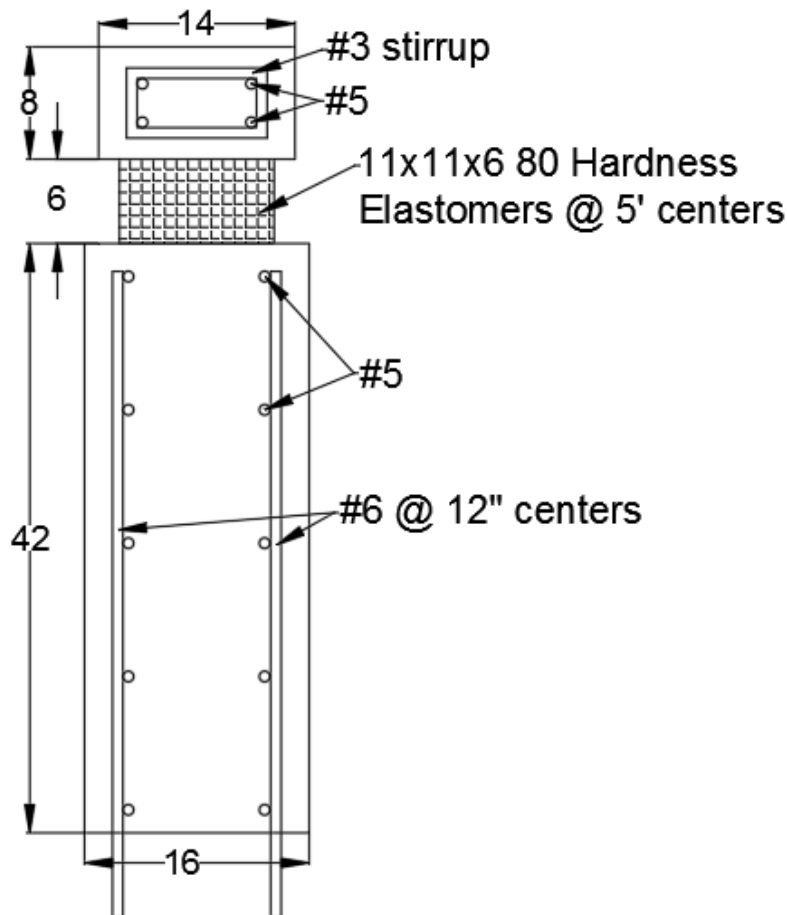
Concept 3 – Rigid Wall and Absorbing Concrete Rail Example
